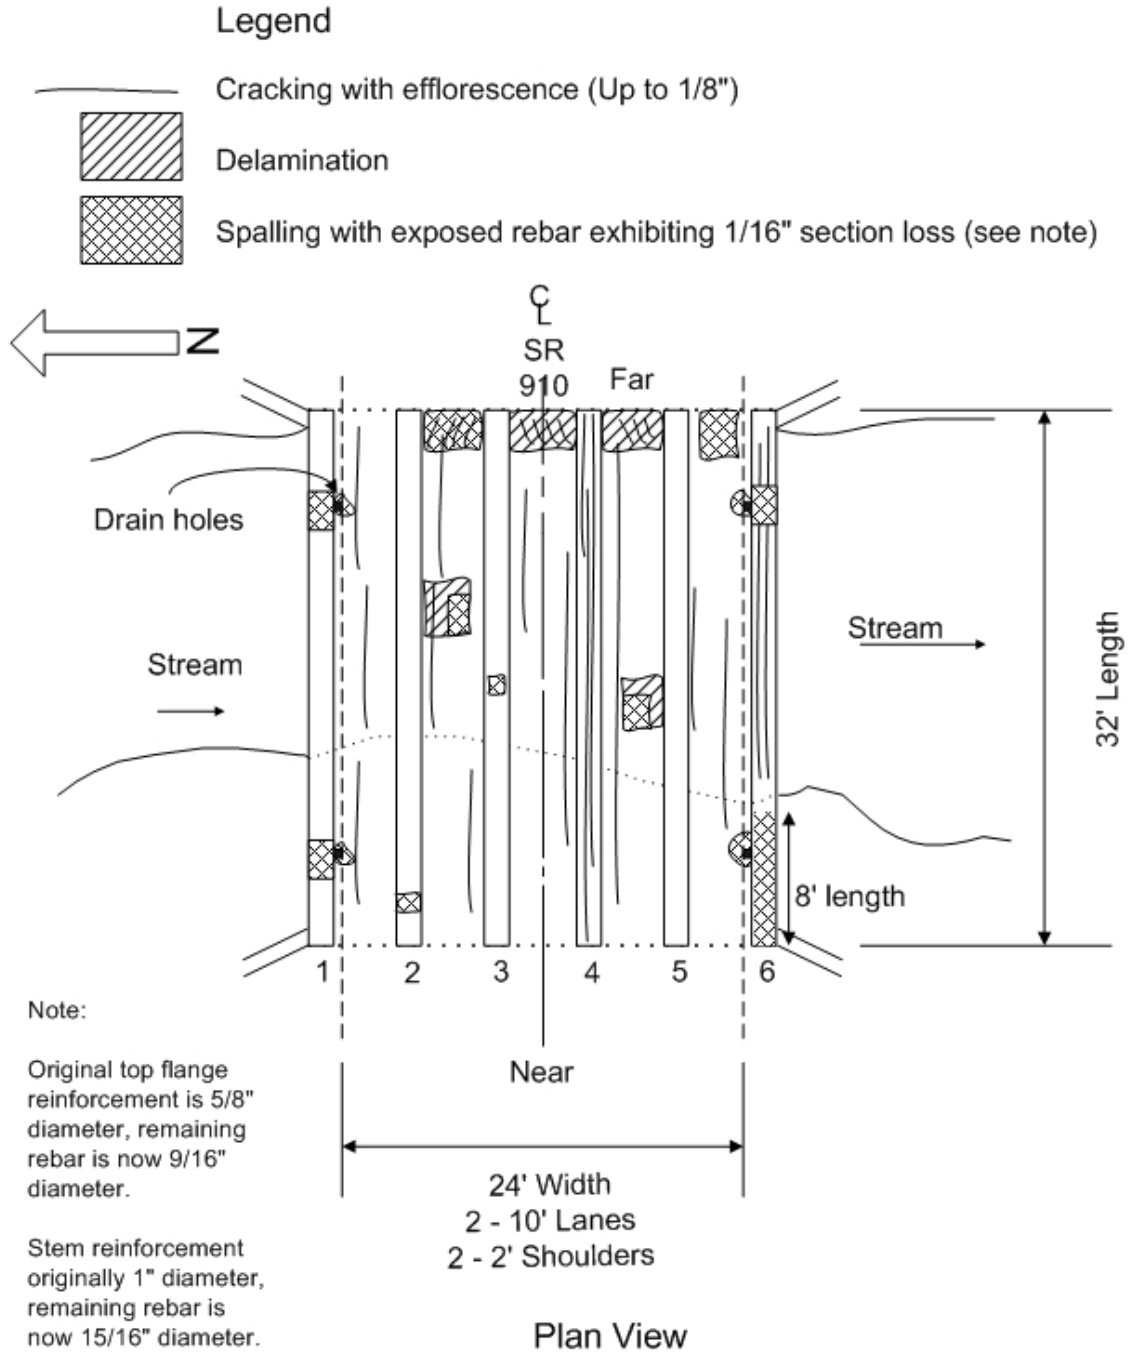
Sample Superstructure Inspection Sketch with Notes
